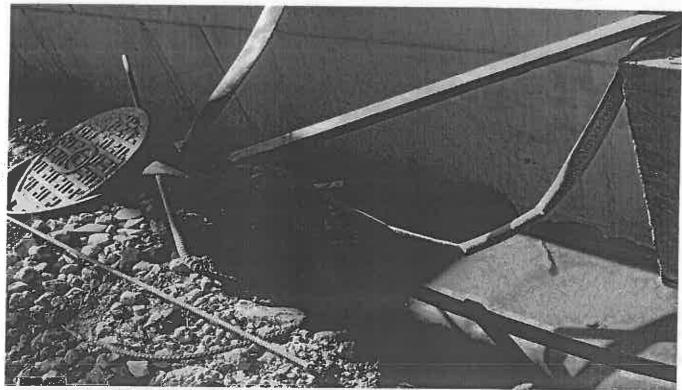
Ongoing pumping of muddy groundwater from foundation footing into active stormdrain onsite.
